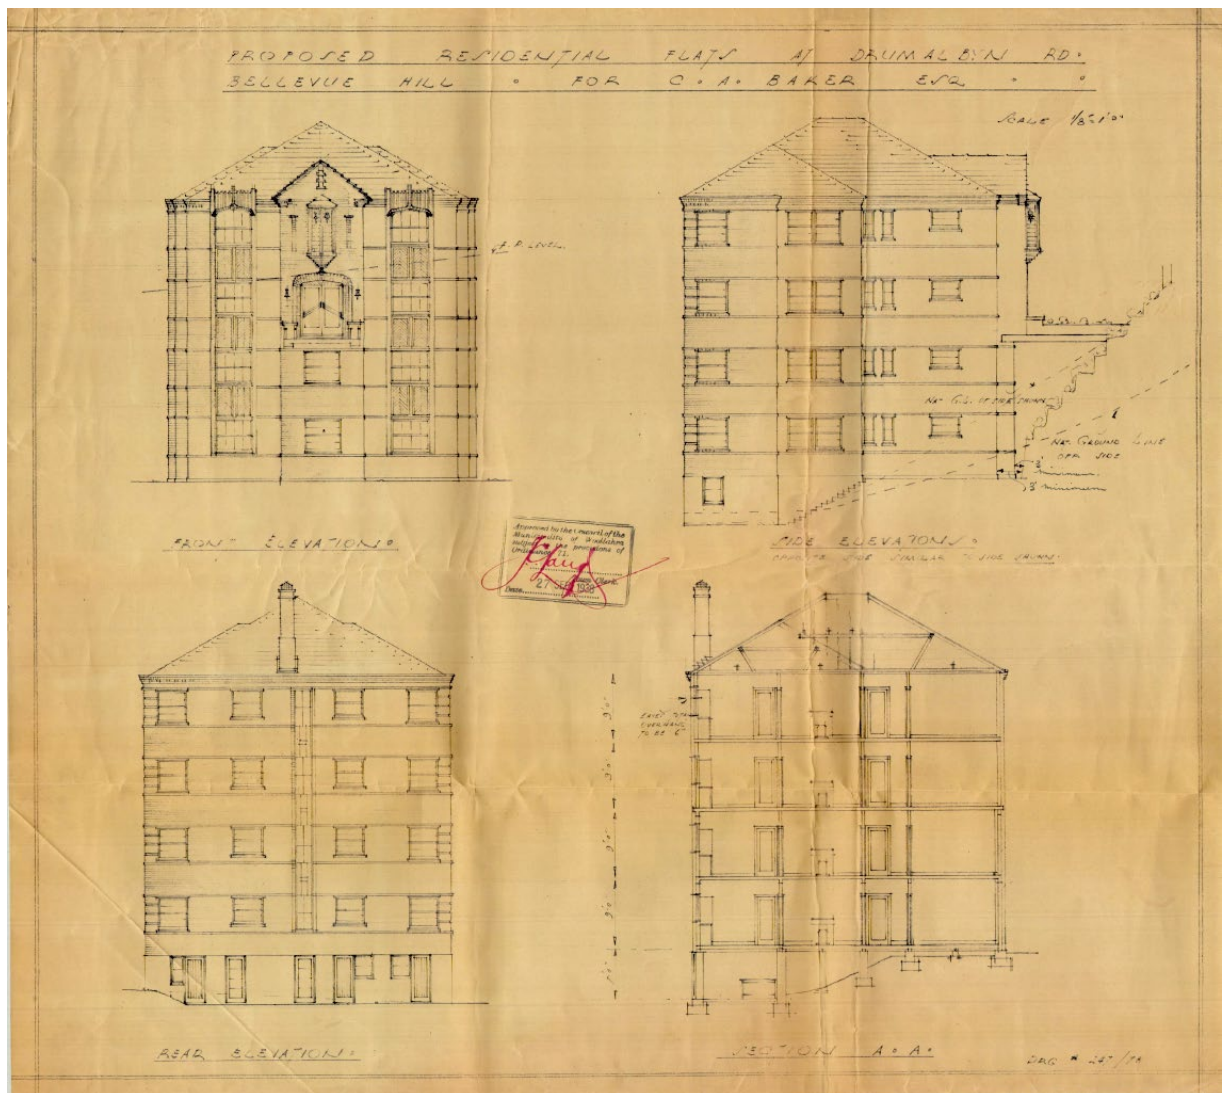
The original drawings for 82 Drumalbyn Road, to which the building appears to have been built. No architect is identified on these plans, but the client - C A Baker - is.
